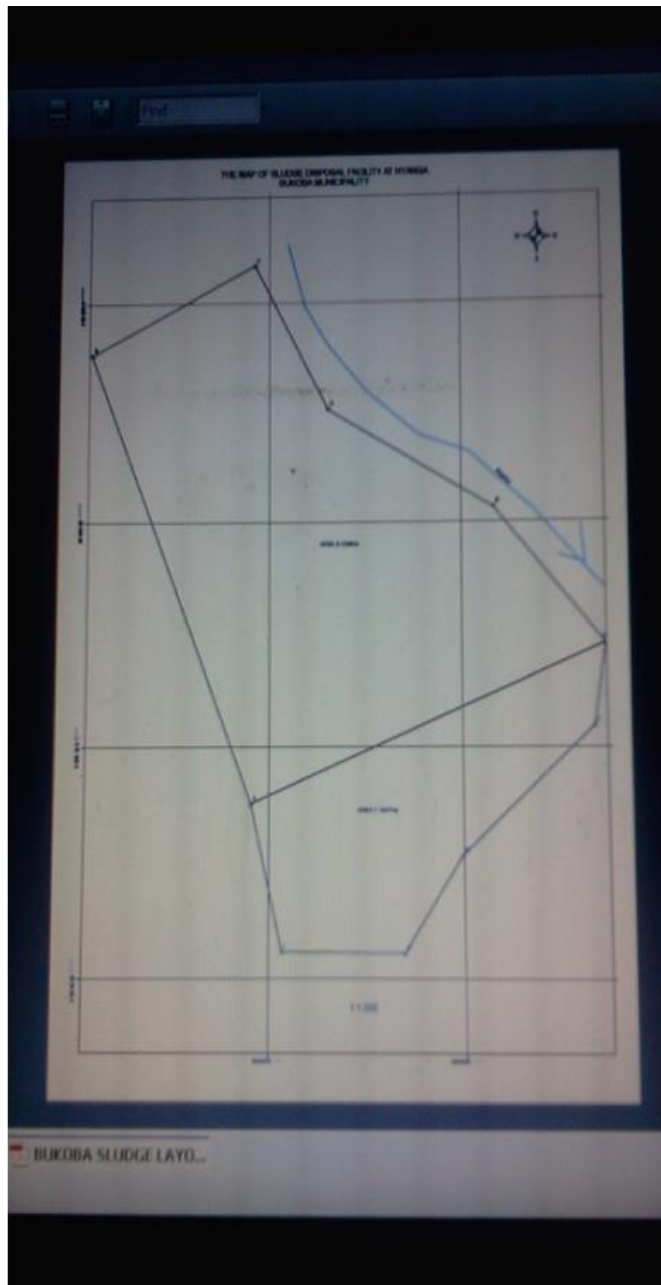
Layout Map of Bukoba Sludge Disposal Facility
